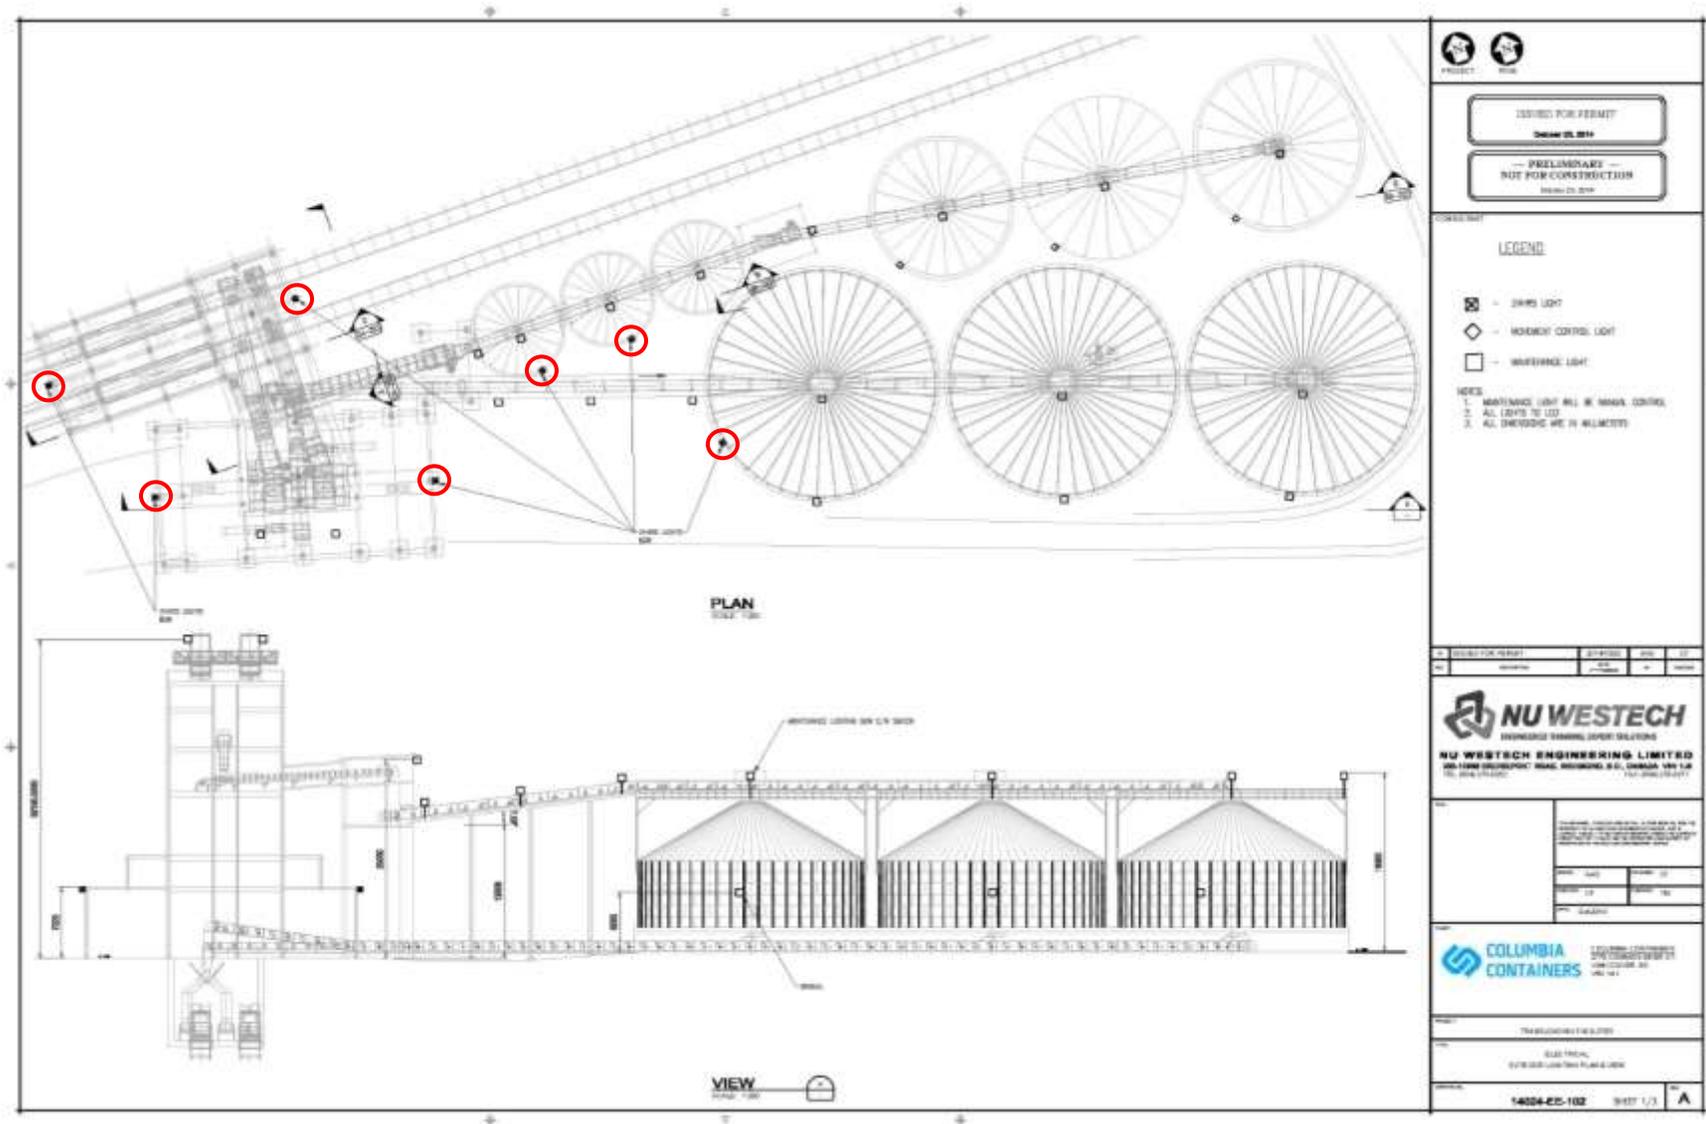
Columbia Containers Outdoor Lighting Plan: view 1, floodlights circled in red (Nu-Westech Engineering Ltd 2014)
